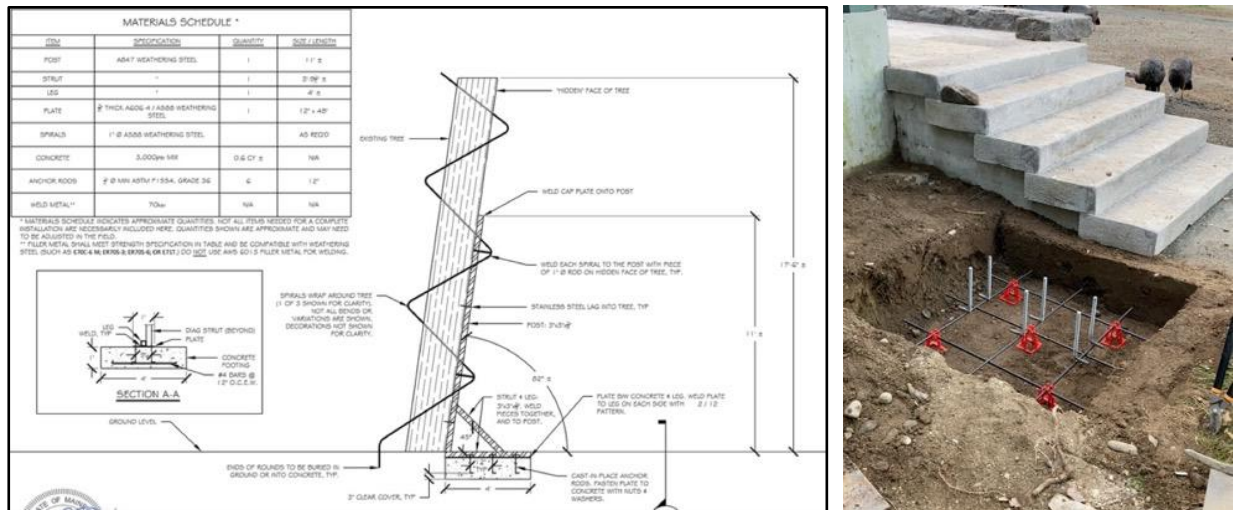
Support brace with concrete footer designed by Hedefine Engineering.
